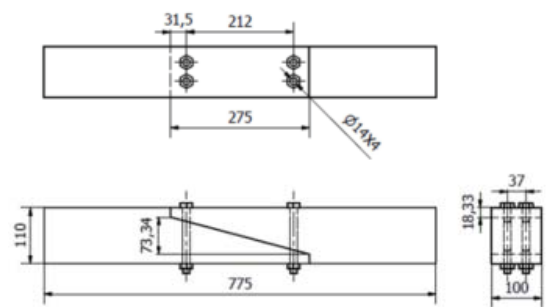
Design of Oblique Lip Joint with Bolt (B3)
